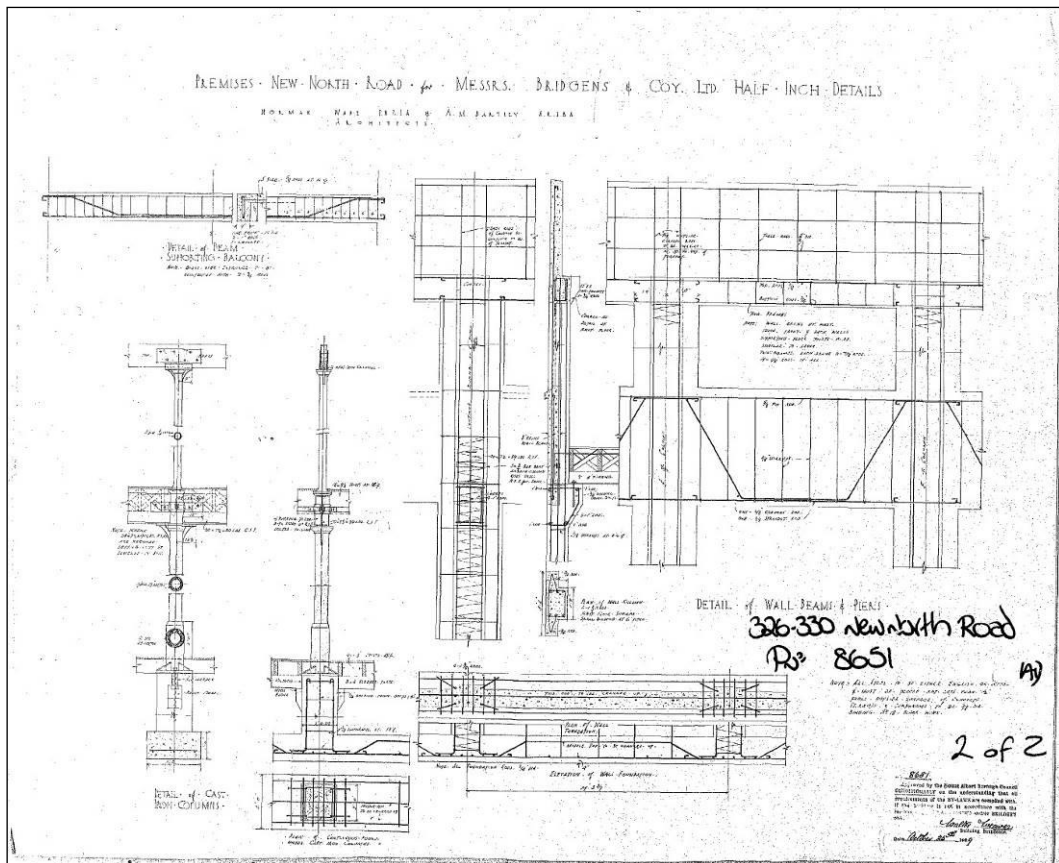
1929 Drawings for 'Premises New North Road for Messrs Bridgens and Coy Ltd' - by Wade and Bartley Architects: Structural Details. Auckland Council Filenet. Accessed October 2016.
